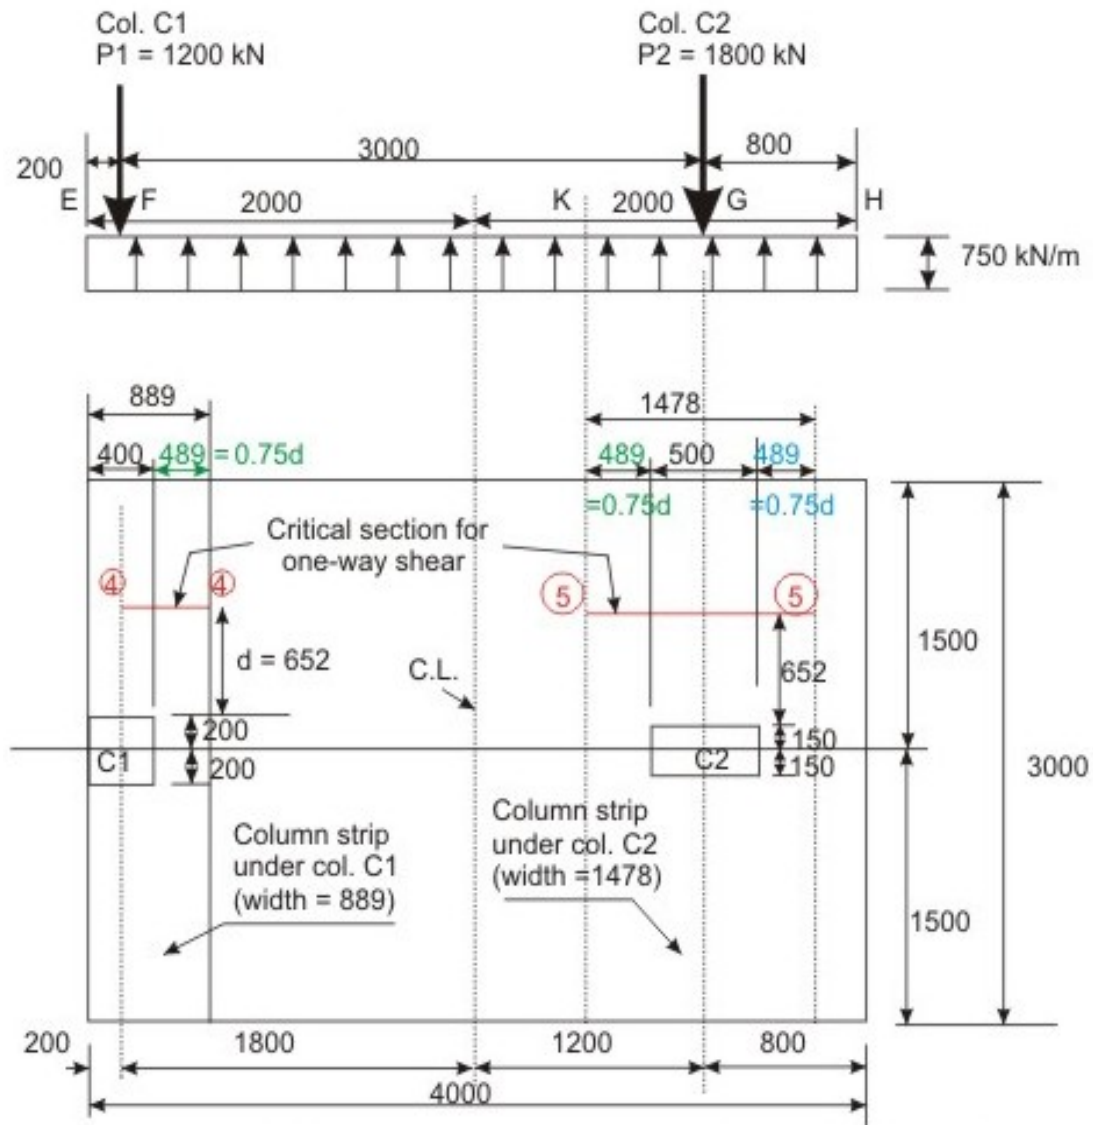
Column strips as transverse beams (Problem 5)
